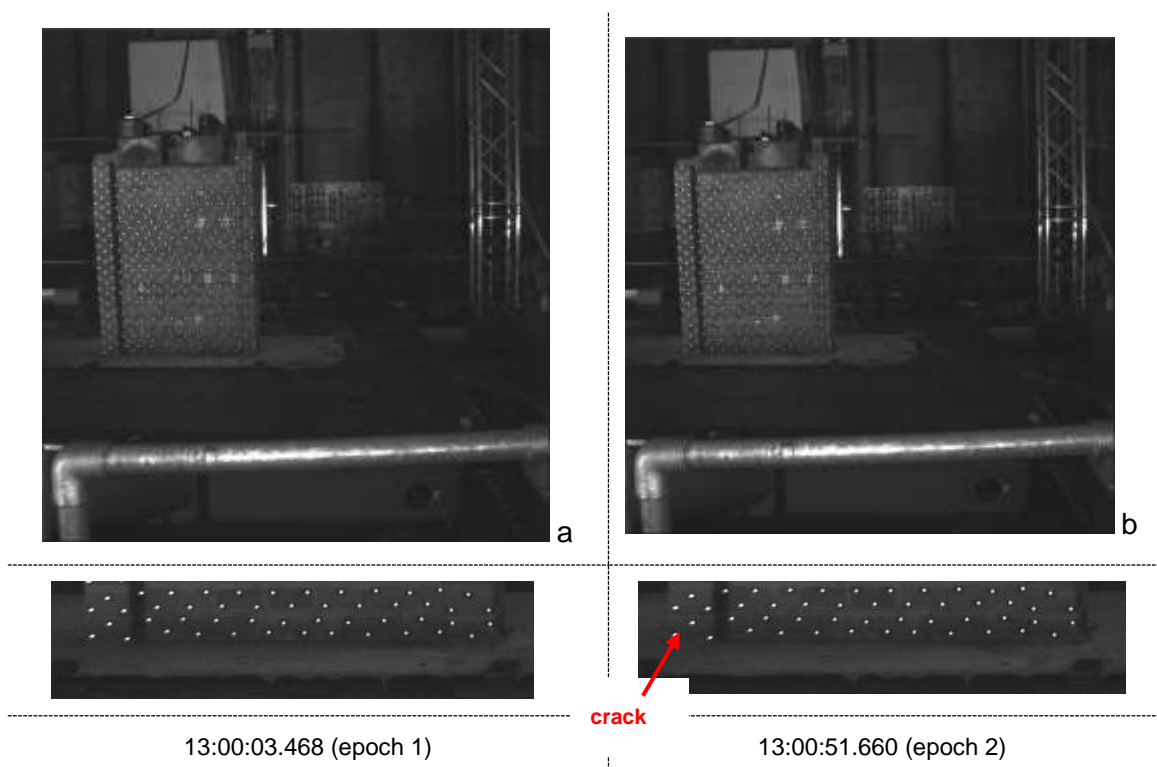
undamaged large-scale masonry specimen – exp 7
